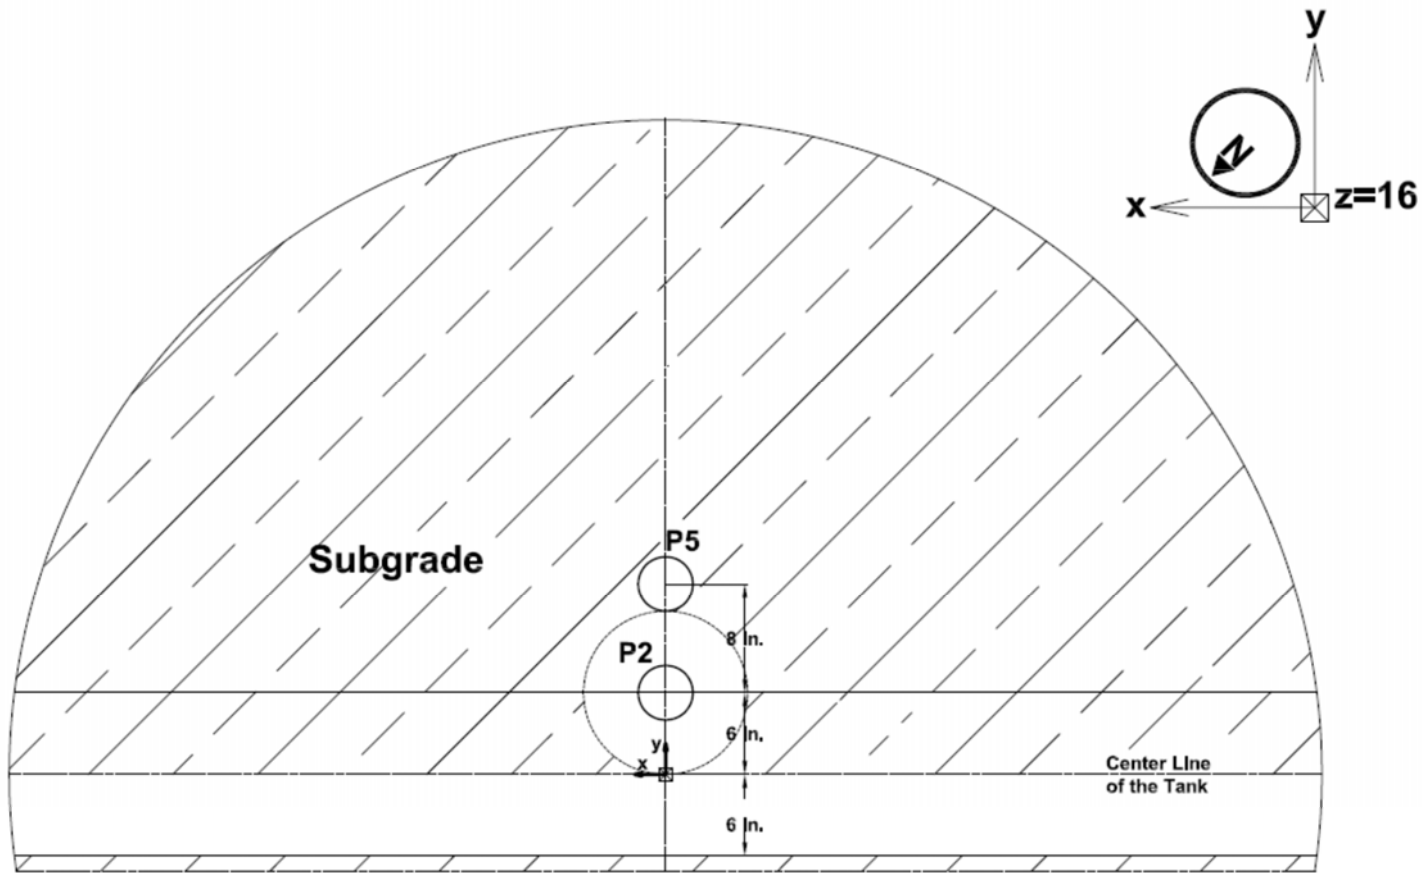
Instrumentation plan for experiment No. 10—Plan view, Z=16 inches
